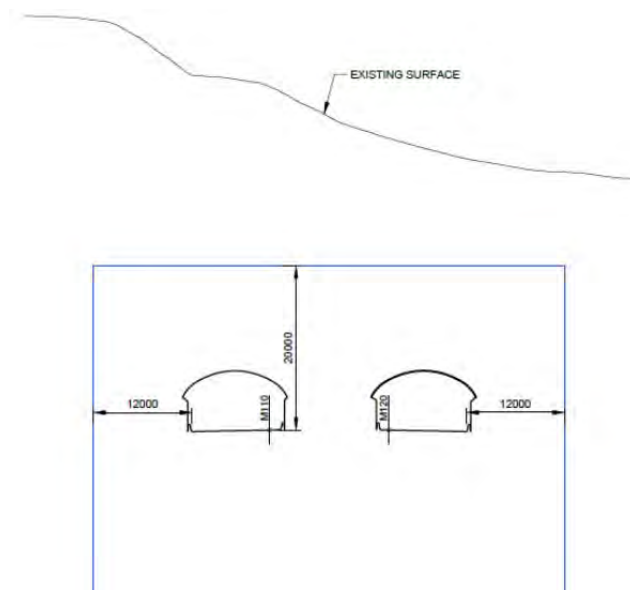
Typical cross section schematic of the tunnel stratum (courtesy LLB and Aurecon-SMEC).
